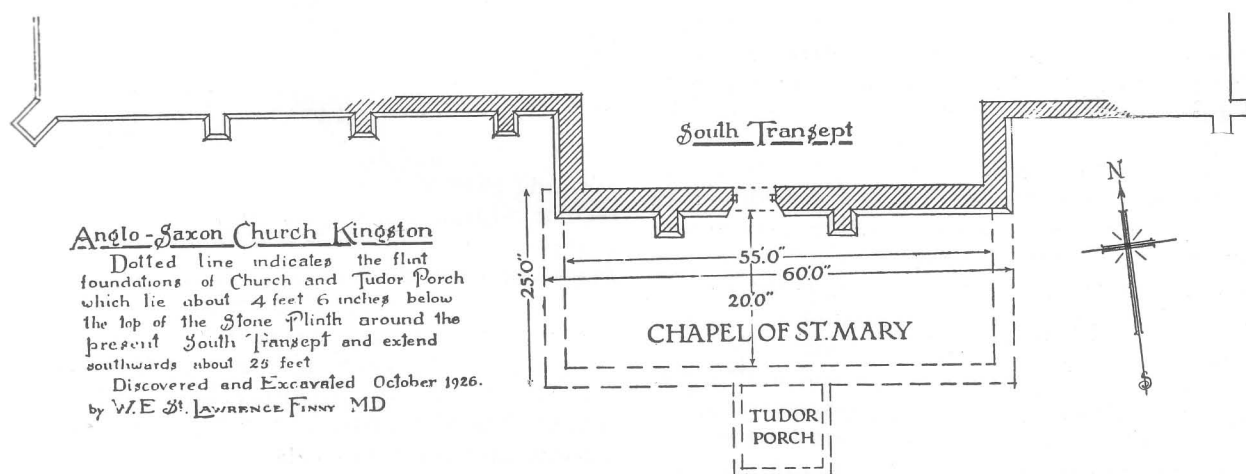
Finny's drawing of St Mary's Chapel floor plan.
